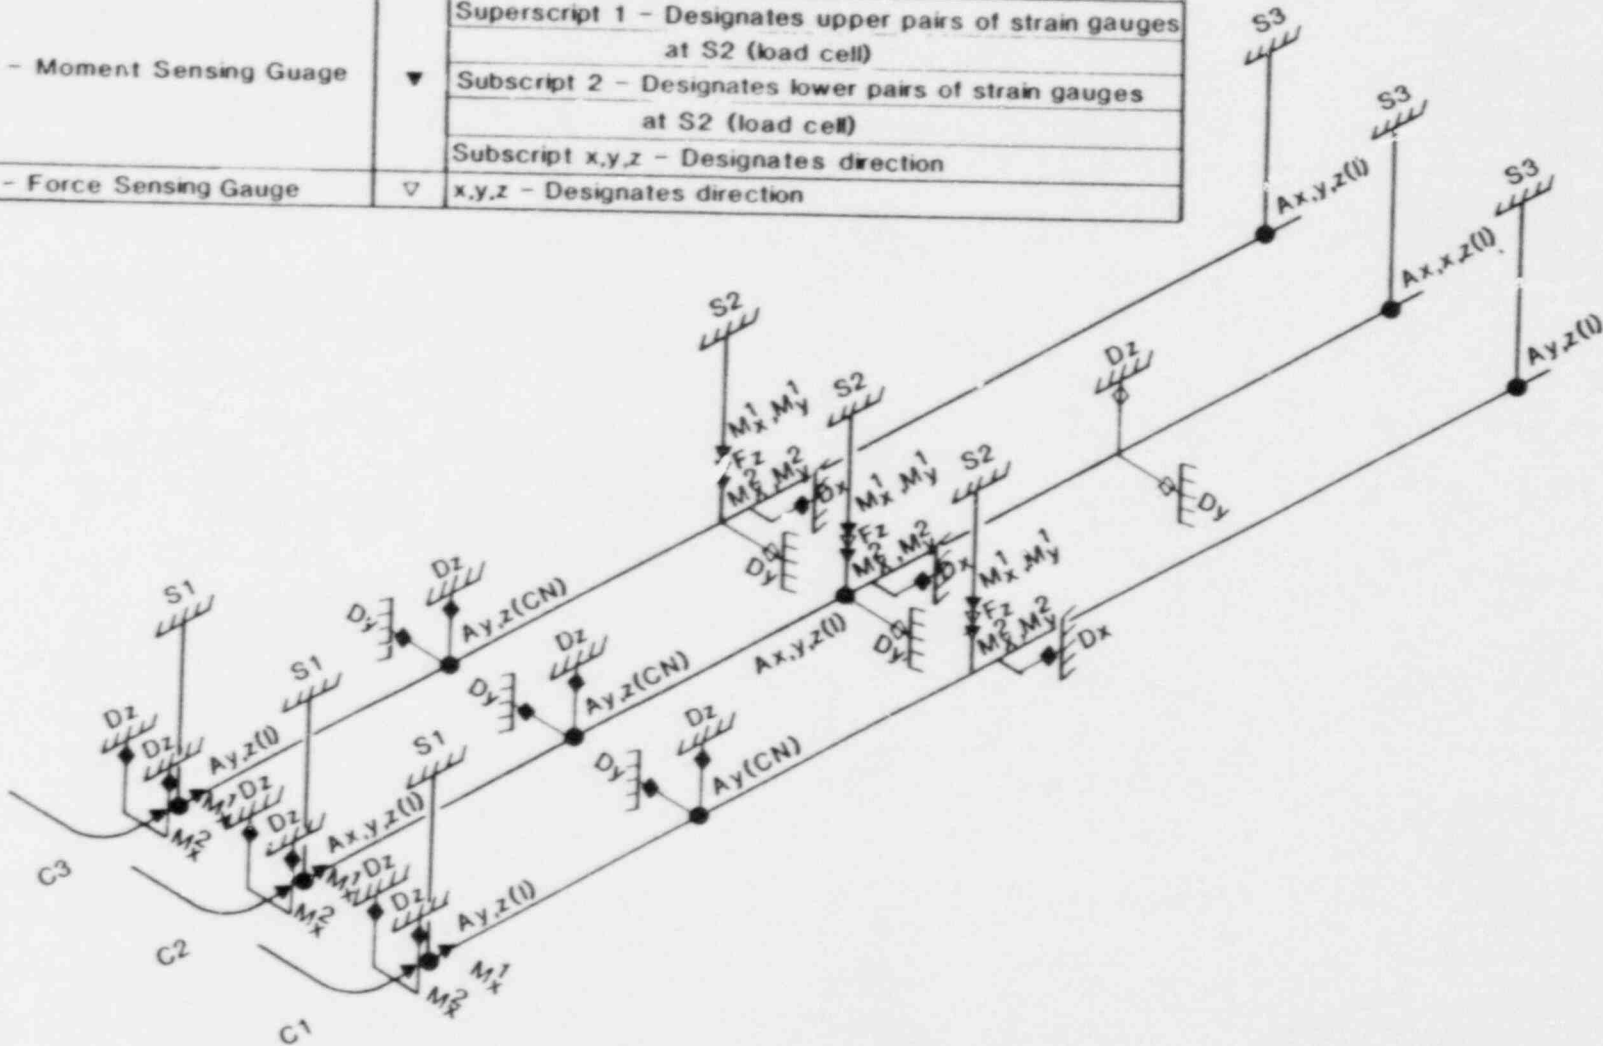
Instrumentation Layout, Test Specimens 1 Through 13, 16 and 17
